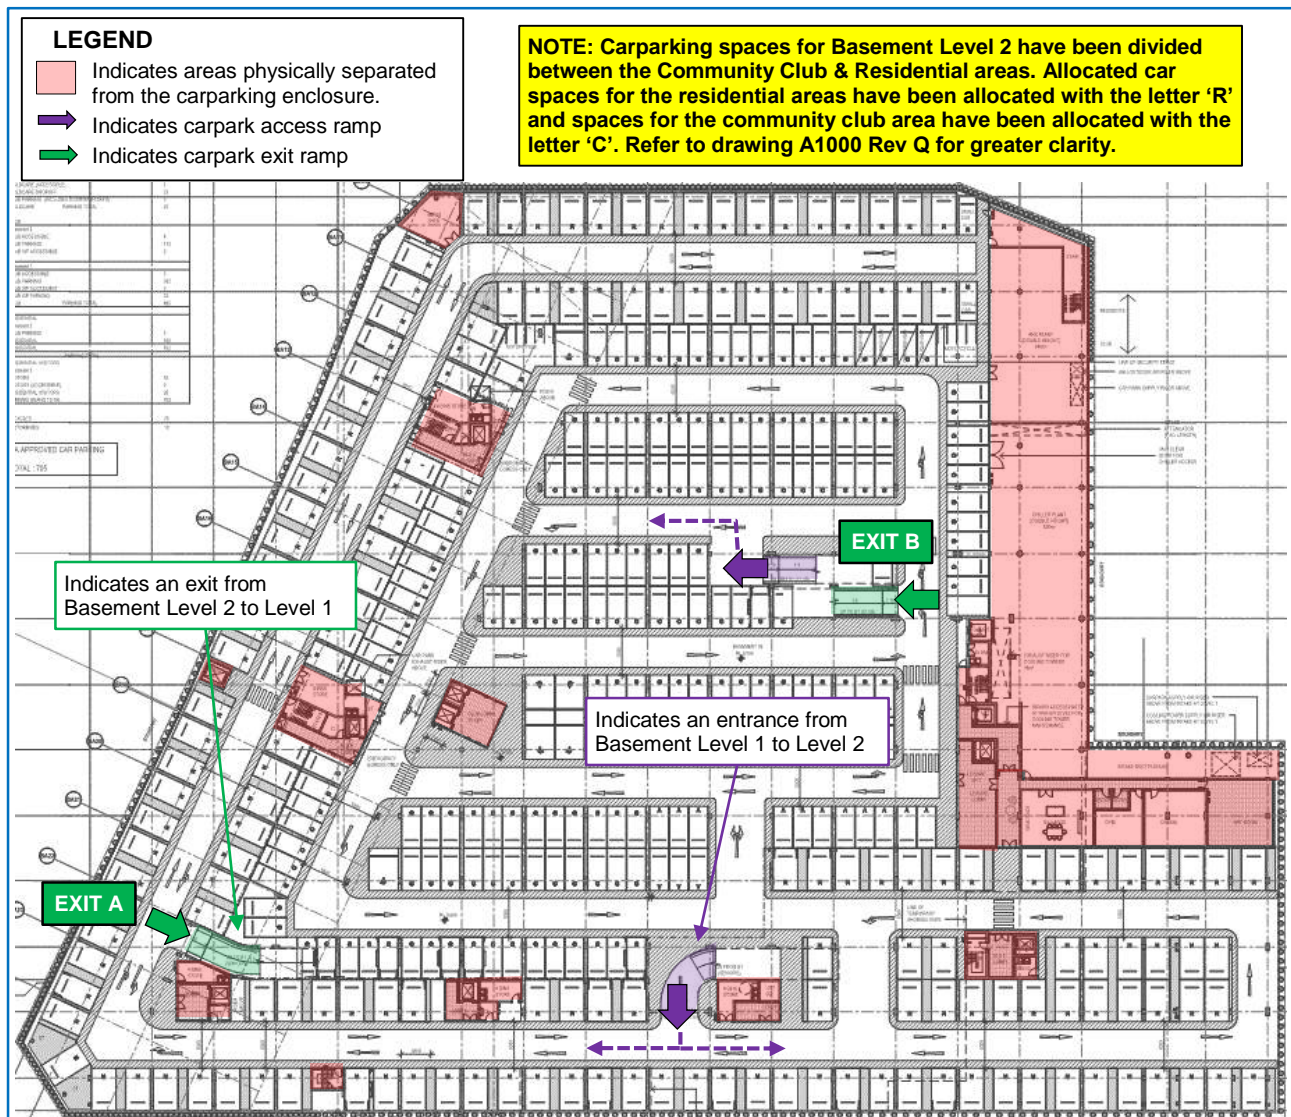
Overall Basement Level 2 Plan – extent of carparking areas
